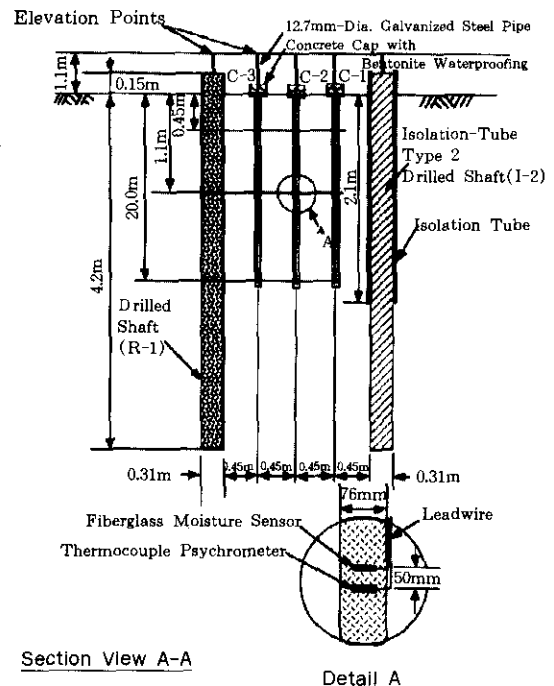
Section View Showing Dimensions of the Drilled Shafts and Locations of Ground Instruments
